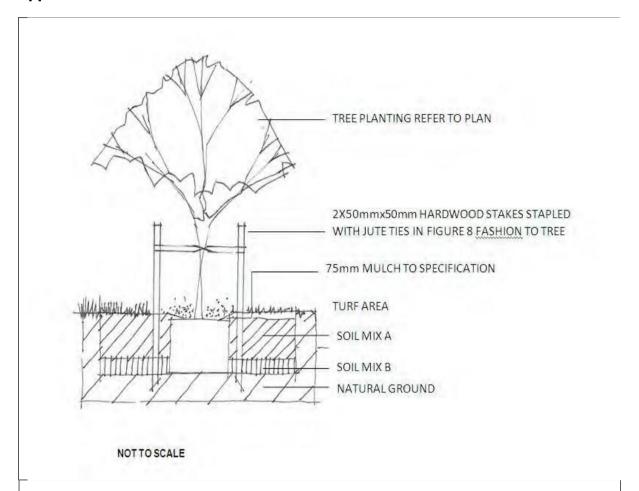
Tree Staking Details for Street Trees for Temporary Protection
